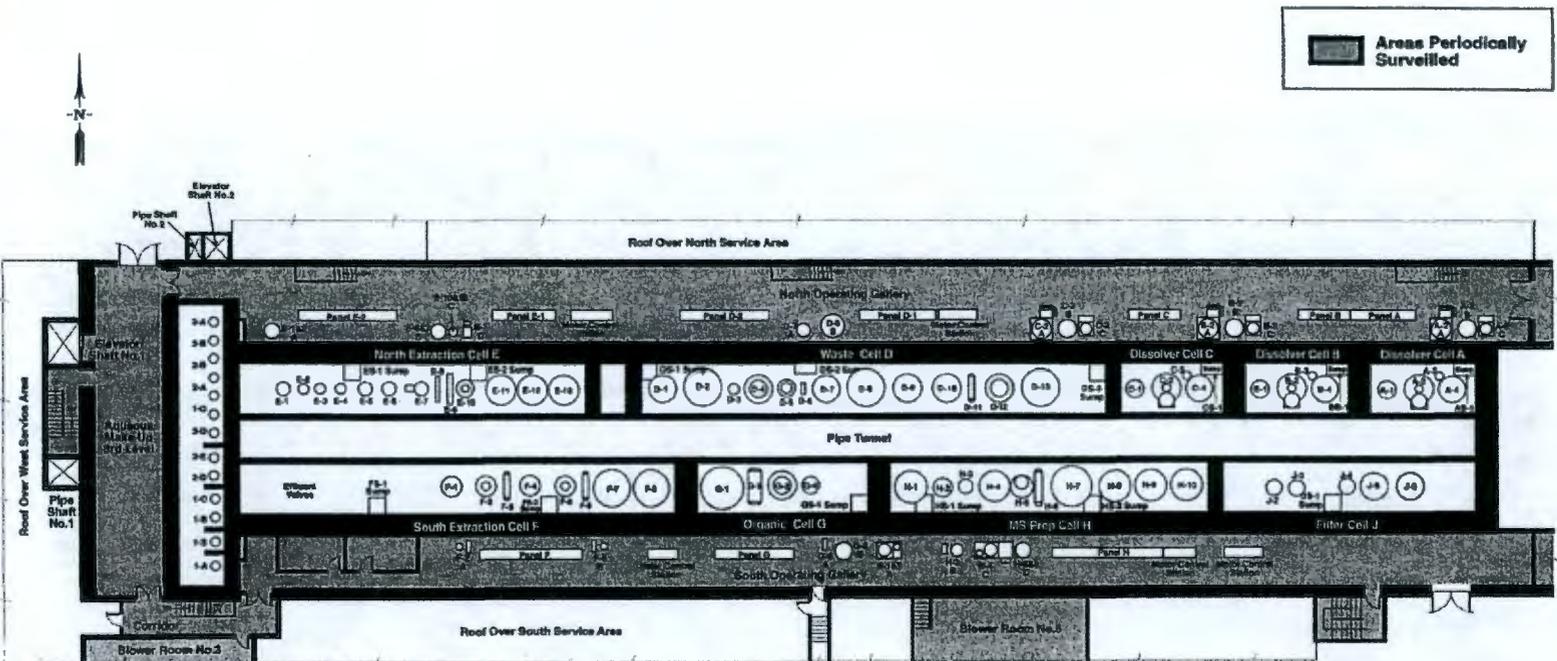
Plan View Canyon, North and South Operating Gallery
